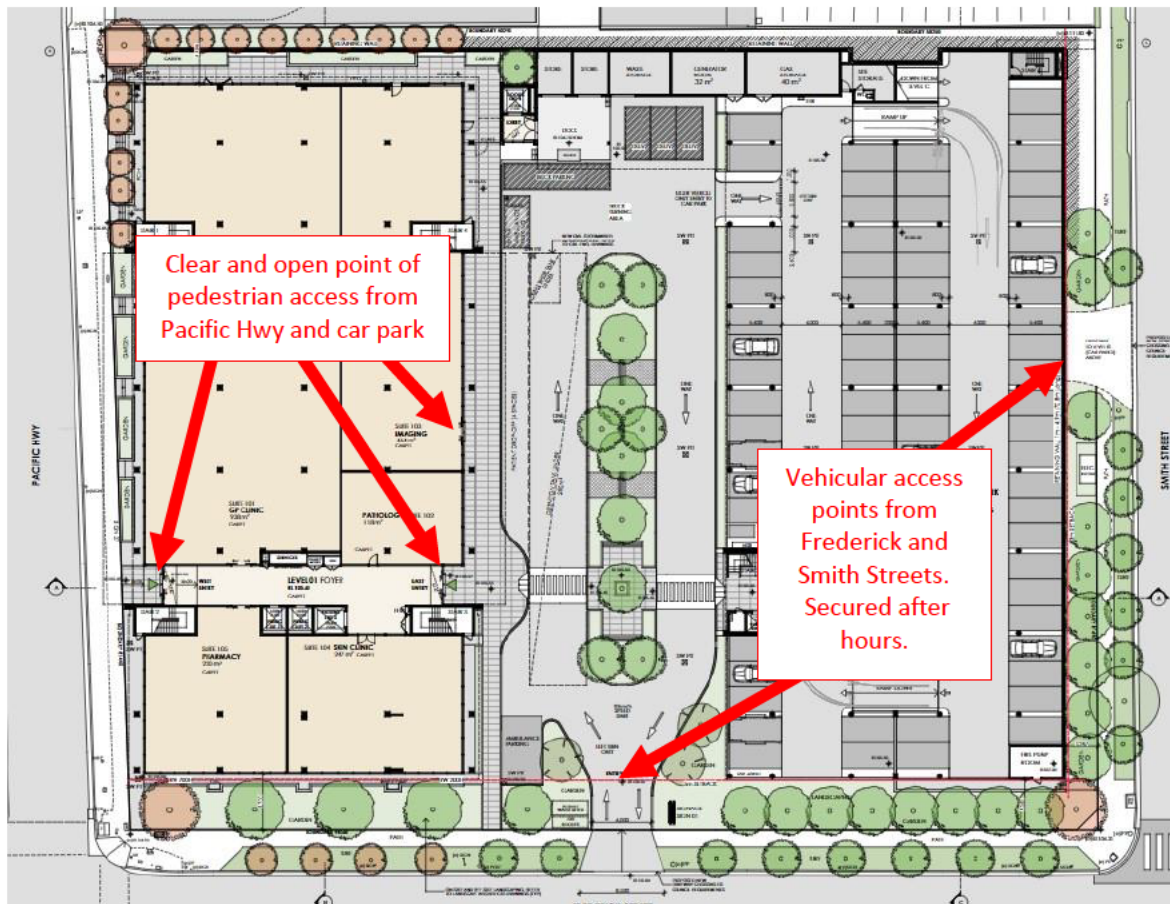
Plan showing vehicular and pedestrian access points – Level 1
